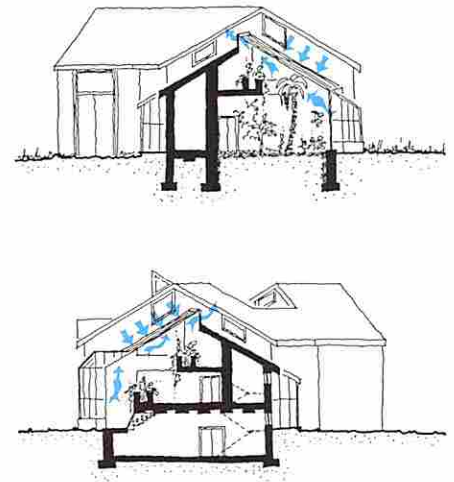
North-south and south-north cross sections of Phase 2 Building Design II
